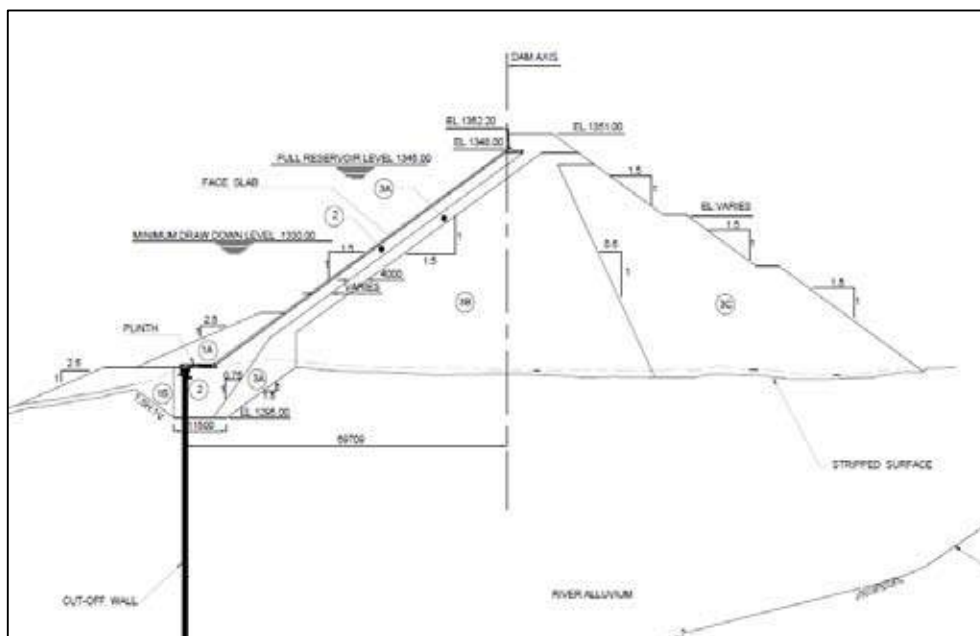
Dhauliganga Hydroelectric Project Stage I: Layout of CFRD
